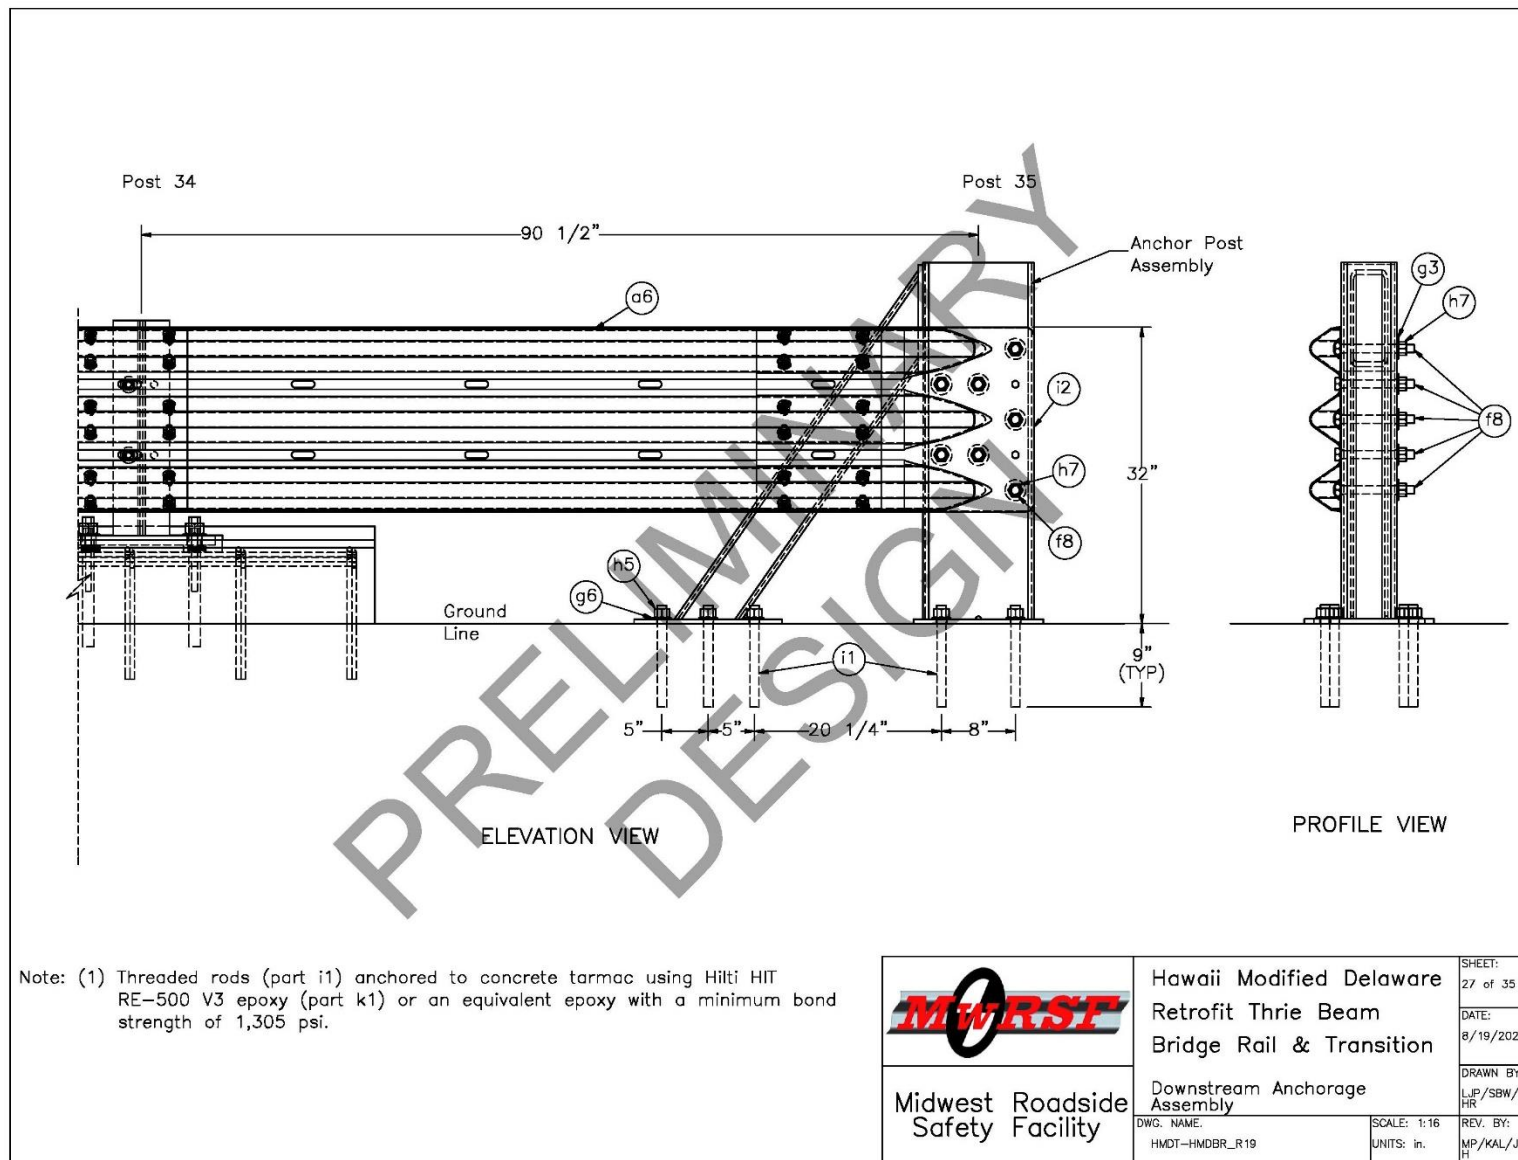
Downstream Anchorage Assembly, Test No. HMDT-1
